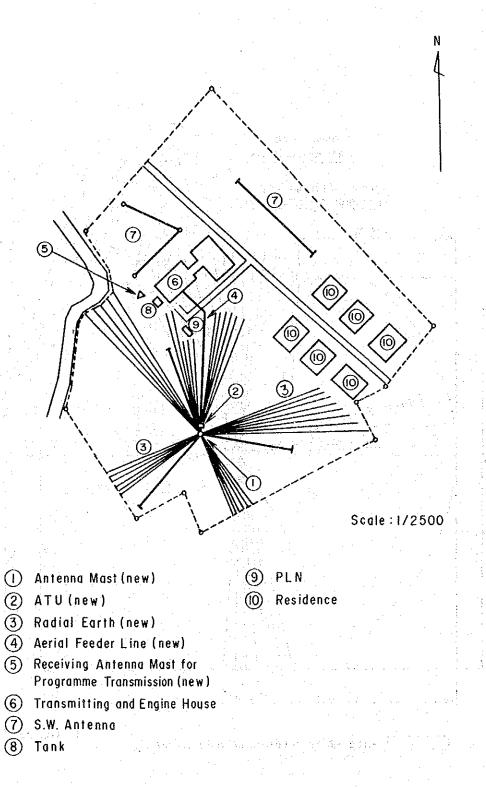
Ternate Transmitting Station; Site Plan - 2
